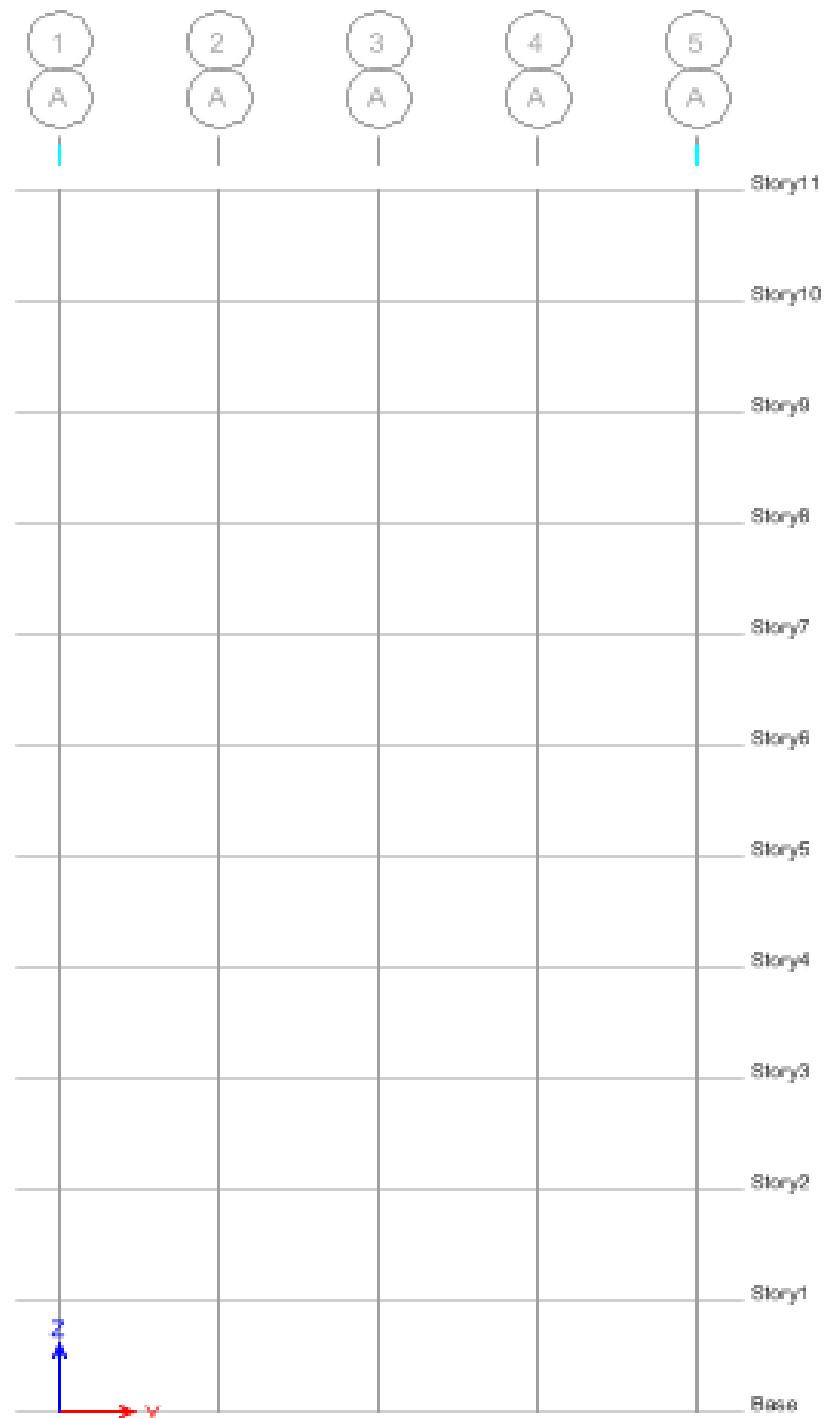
Elevation of OGS Building Having No Support in Ground
